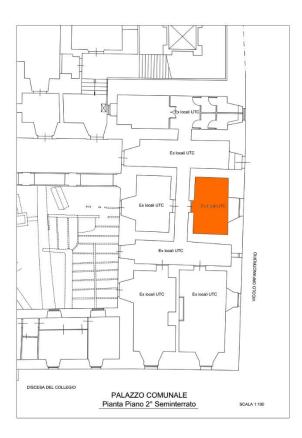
Planimetry of the 2nd basement floor, under the MAN. In red, the room for the Bank of Gemoplasm.
